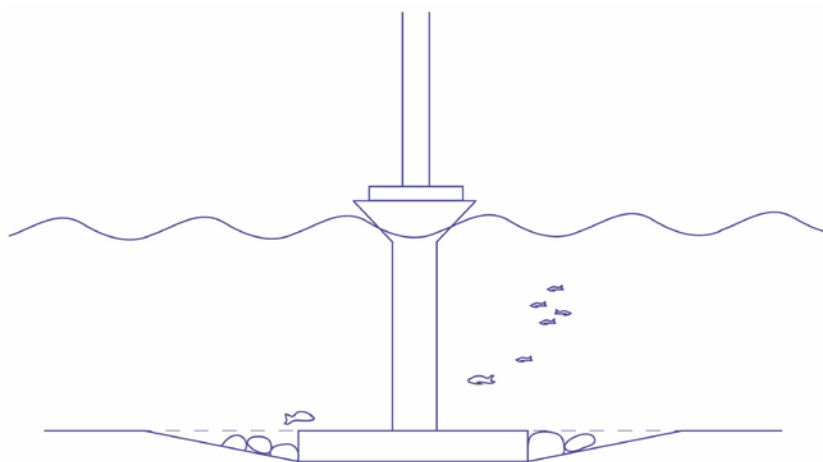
Schematic drawing of a gravity-based foundation made of concrete (scales and dimensions are not proportional).
